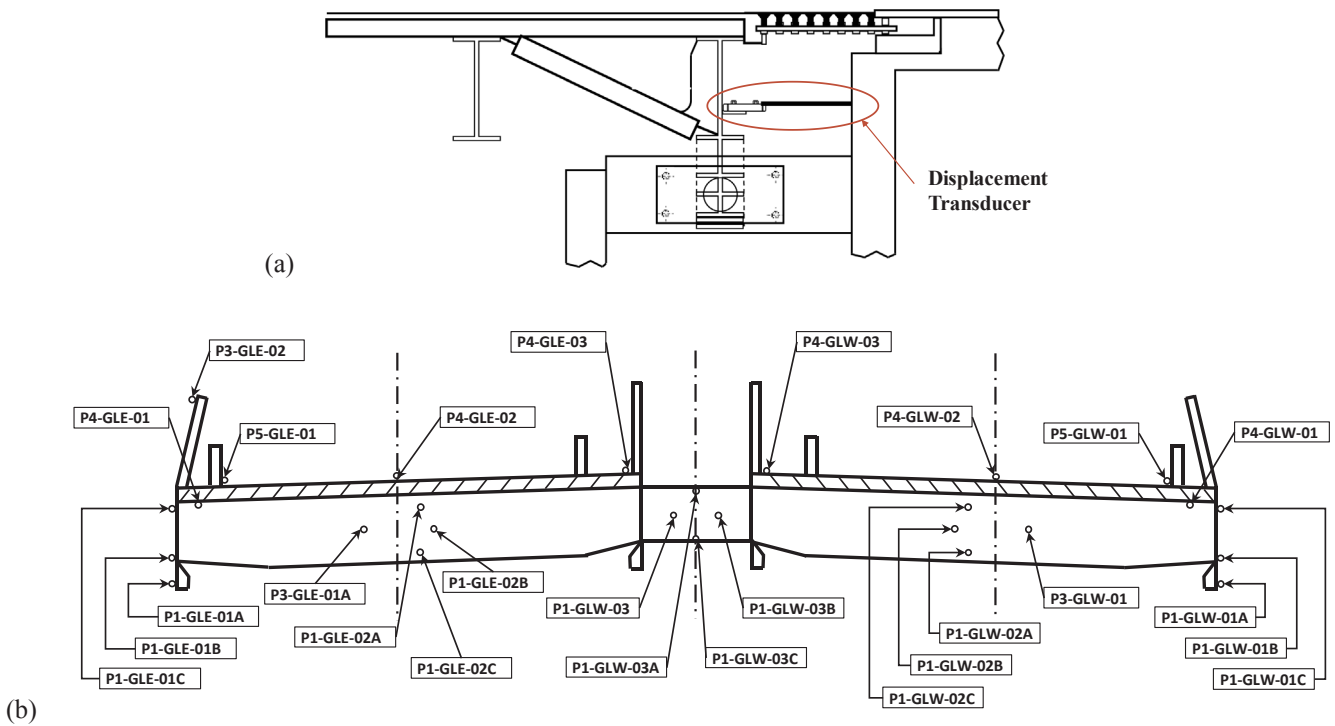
Layout of sensors on Ting Kau Bridge: (a) displacement transducer at Tsing Yi abutment; (b) temperature sensors on deck cross-section.
